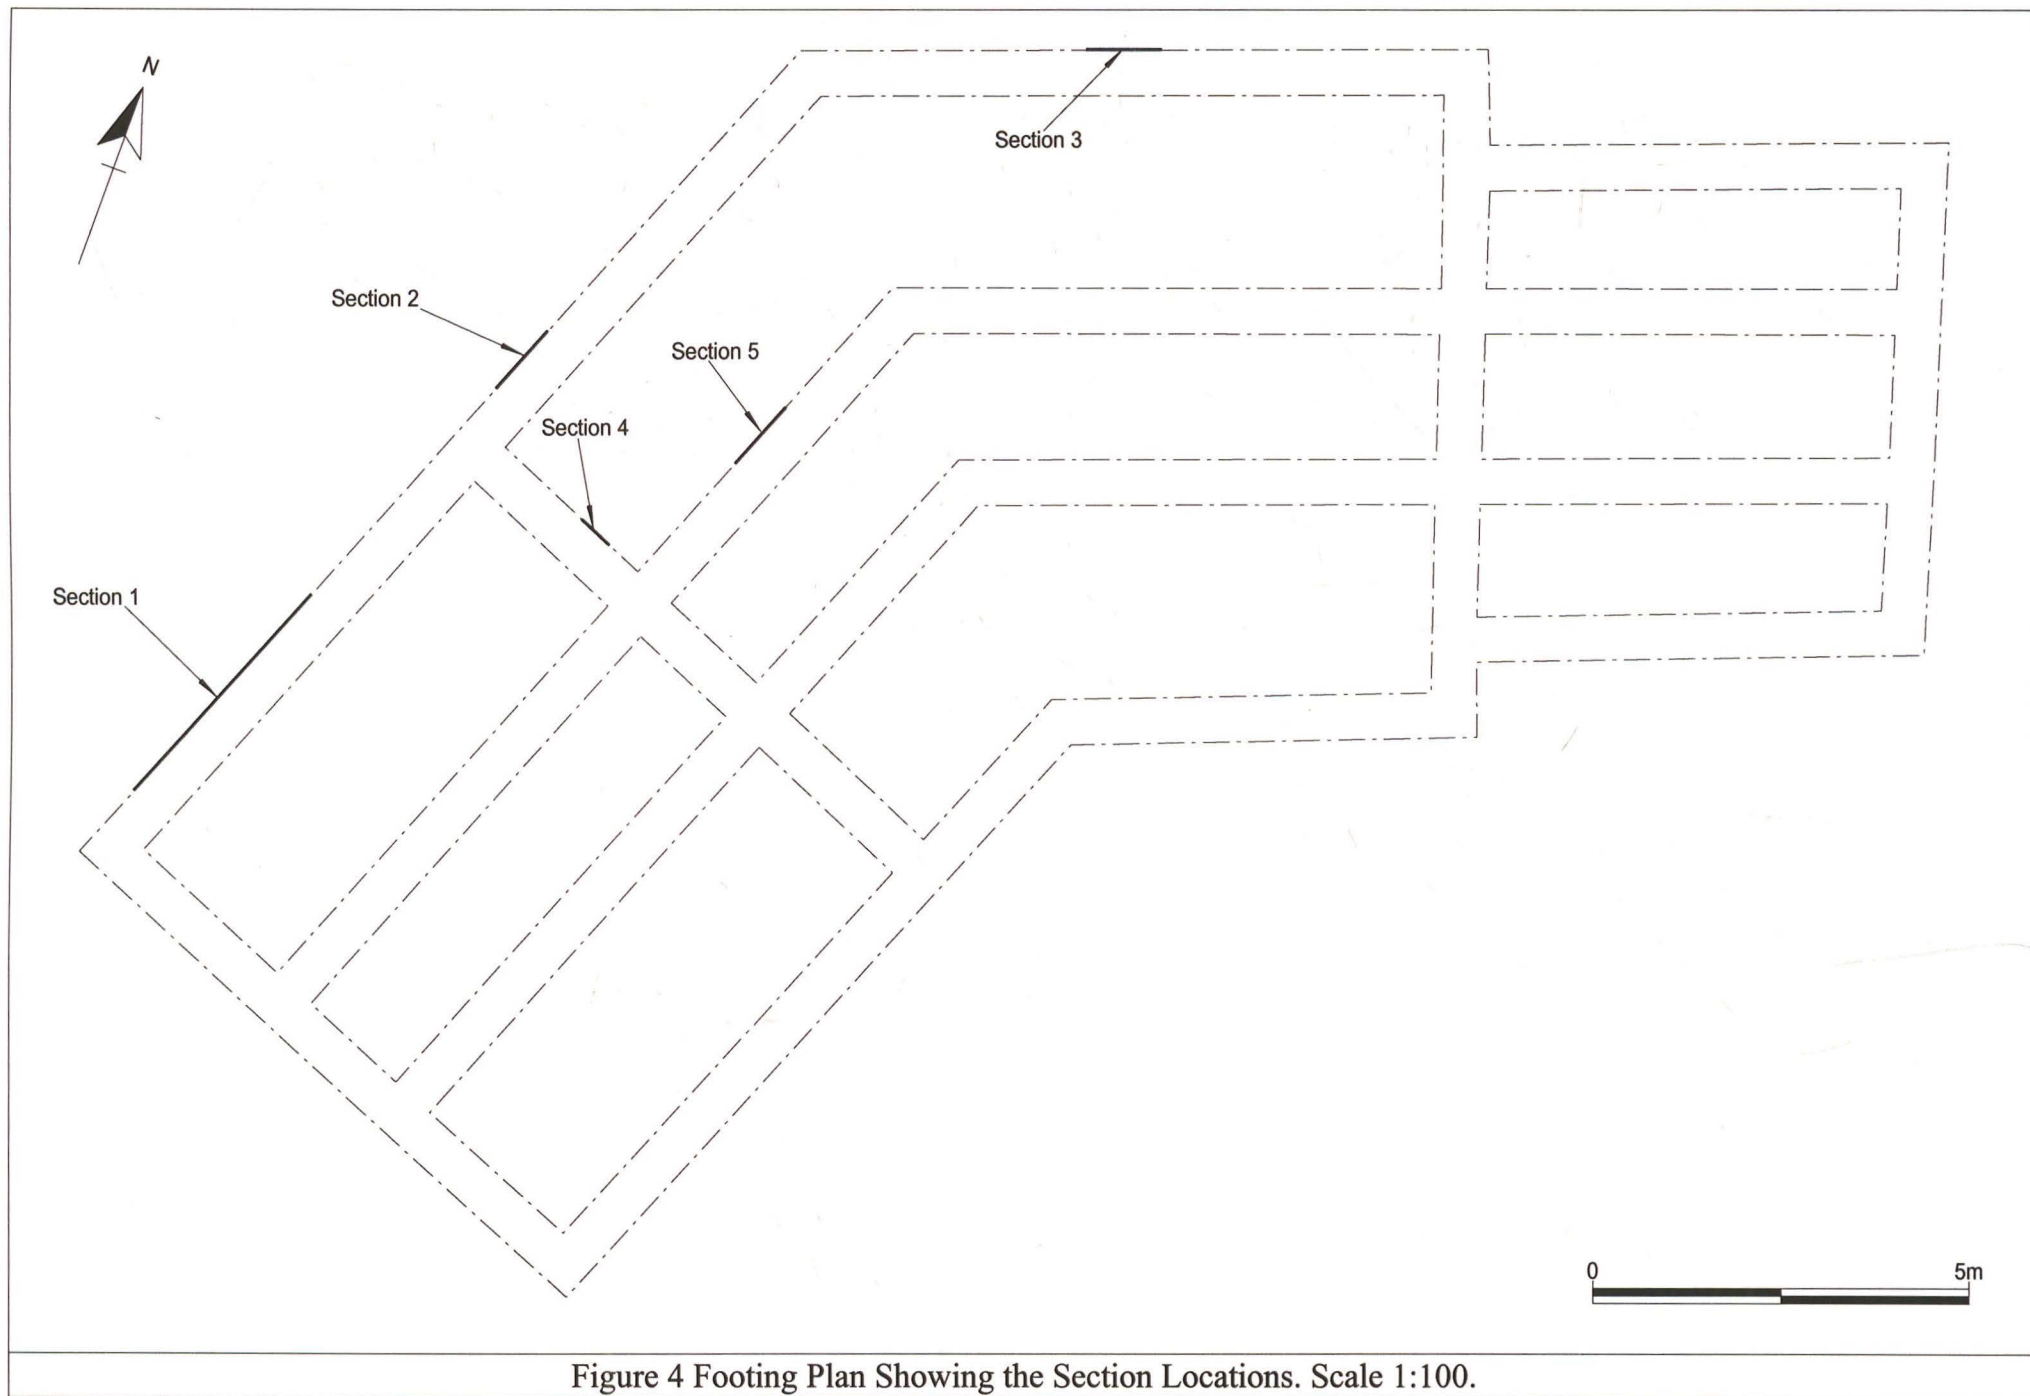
Footing Plan Showing the Section Locations. Scale 1:100.
